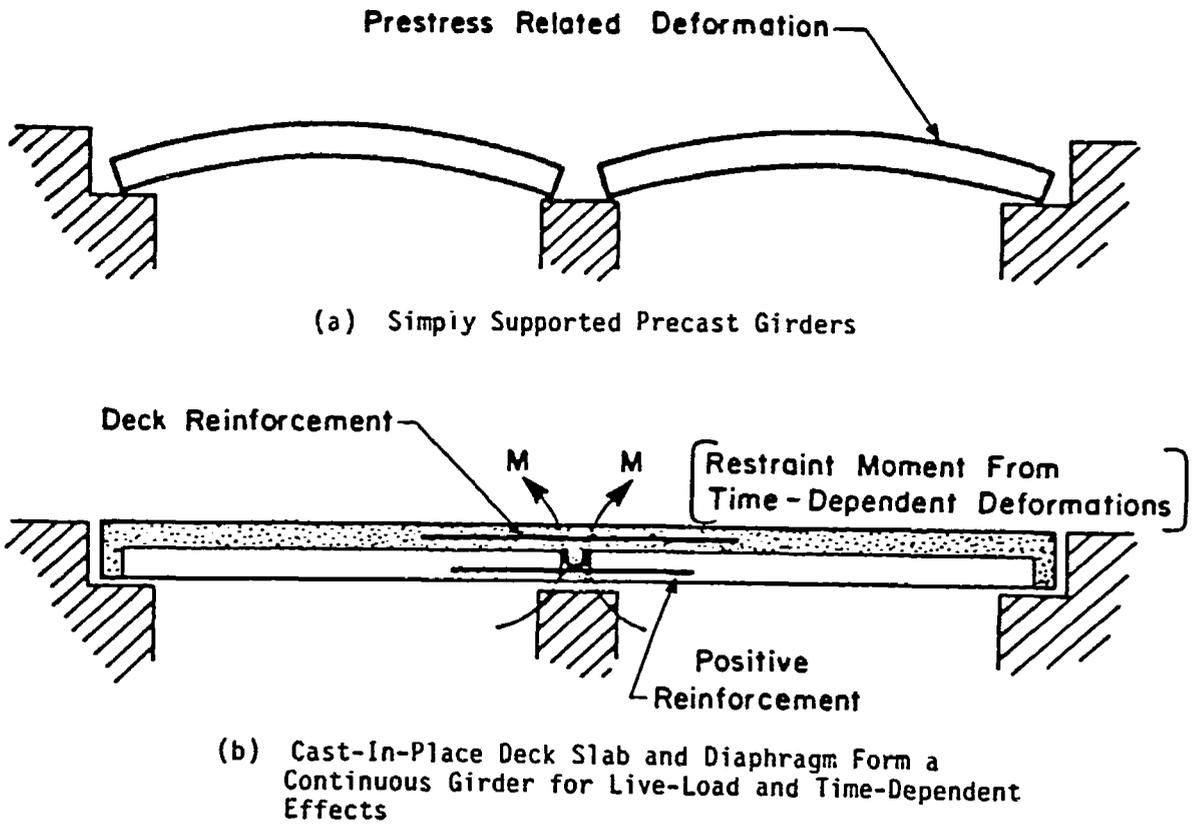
Two-Span Bridge with Precast, Prestressed Girders Made Continuous
